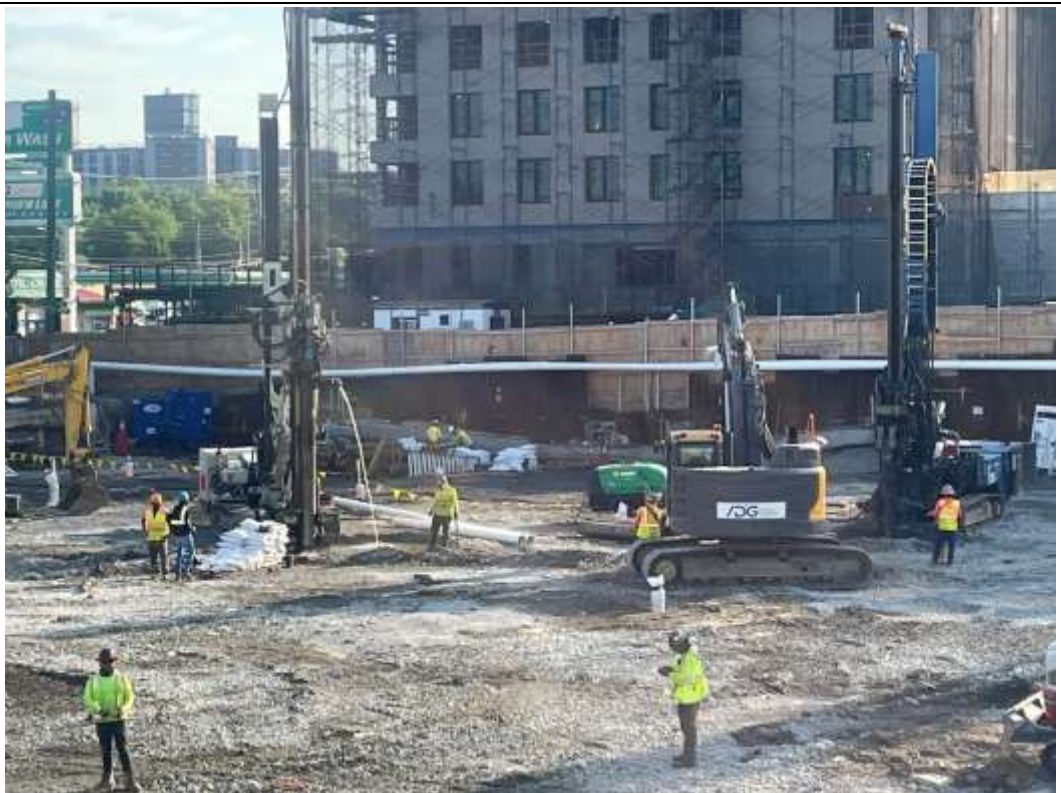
United installing walers in the northern portion of the Site, facing northeast.
